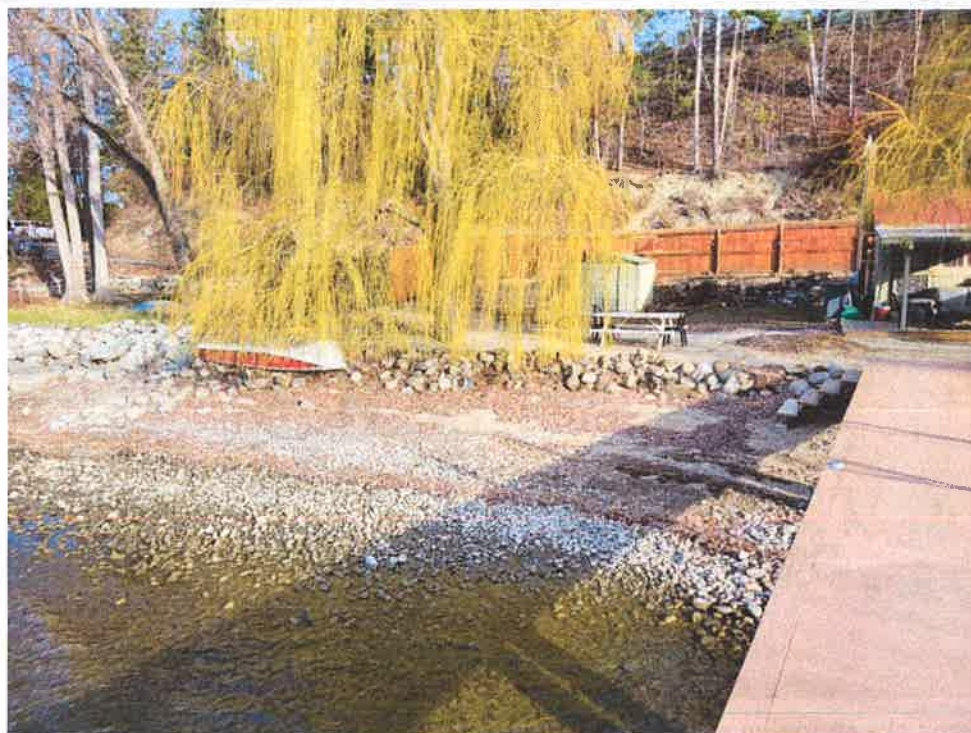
Okanagan Lake shoreline and rock wall along southern property boundary, west of the private dock; taken looking north
